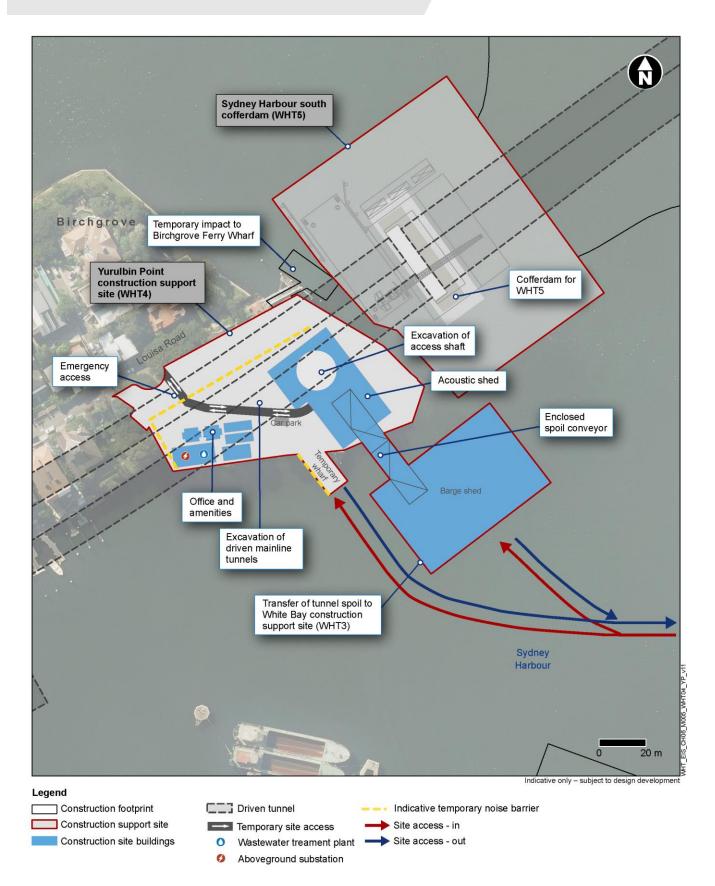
Indicative construction support site layout – WHT4 – Yurulbin Point
